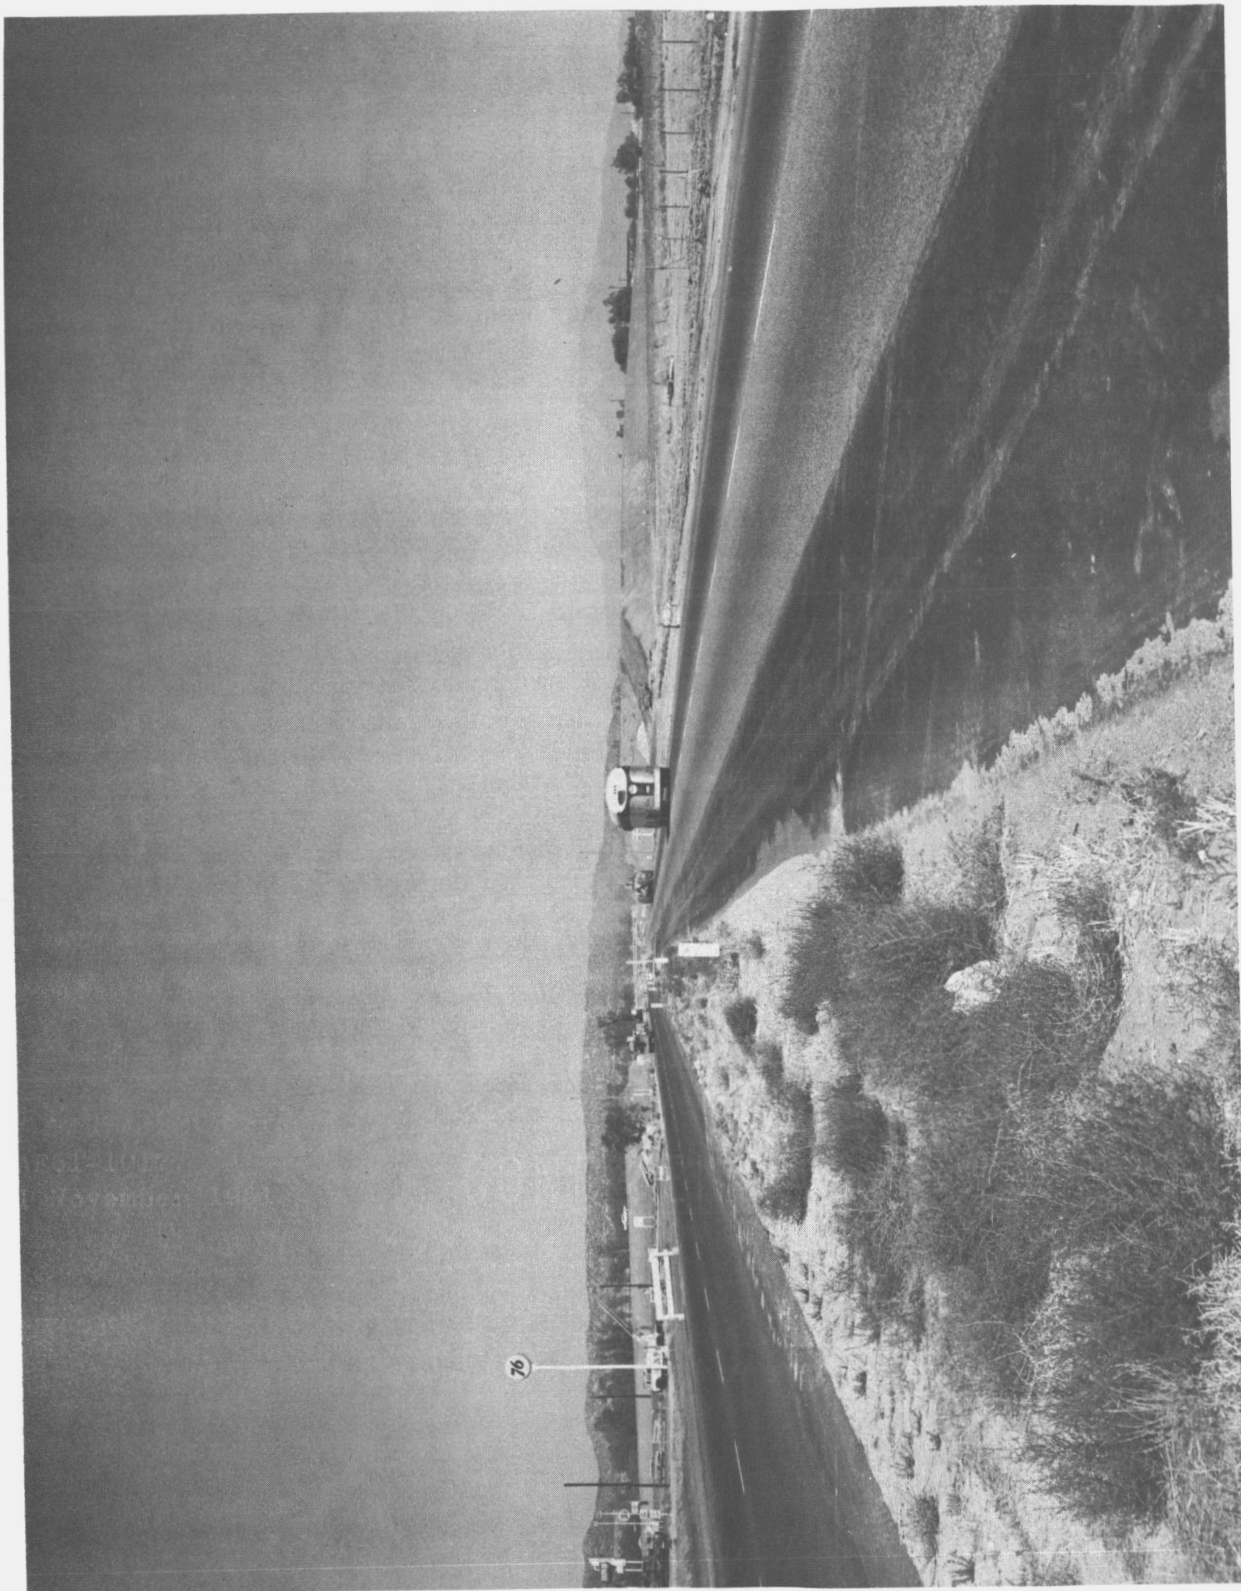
Construction of Overpass on U. S. Highway 395, Perris, California
